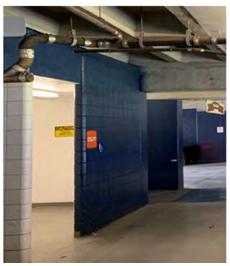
ACCM (Asbestos content between 0.1-1.0%): Stucco at ceilings at restroom entries on Plaza level.
